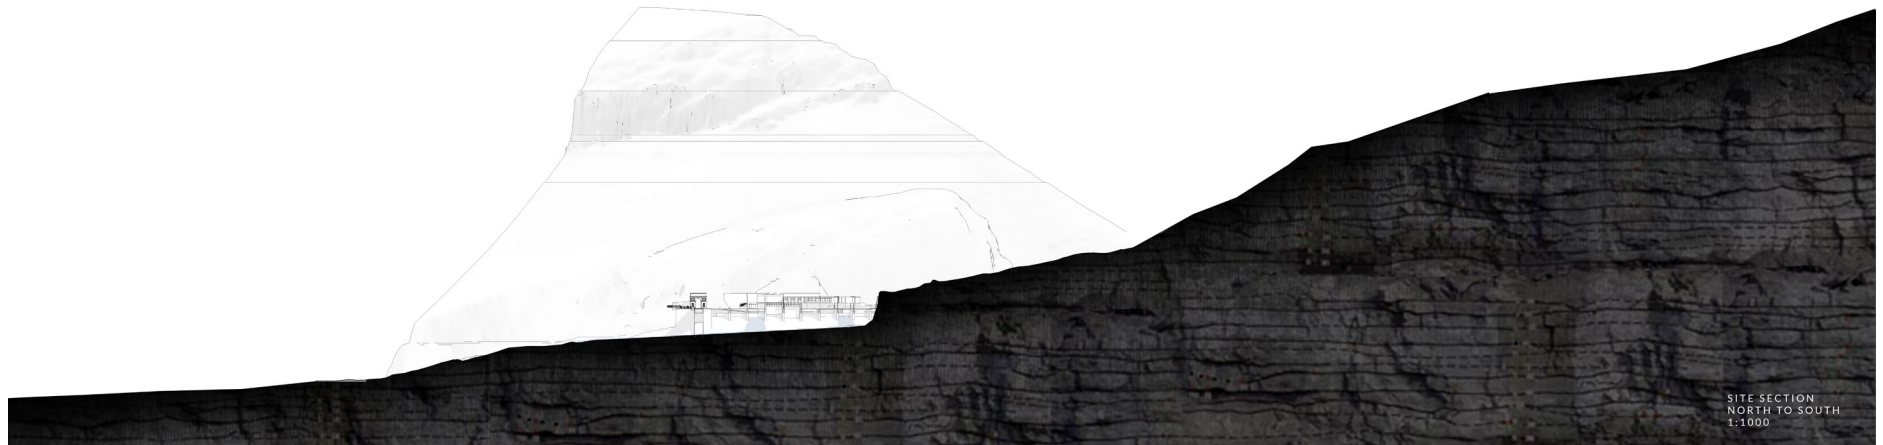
Longitudinal section North to South (Author, June 2016).
